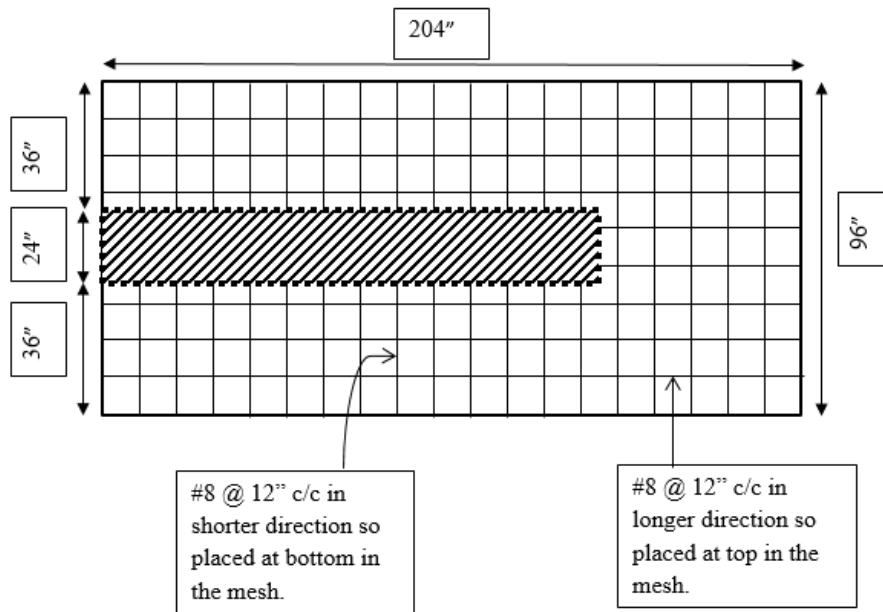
Reinforcement Detail for Footing – Bottom Slab
